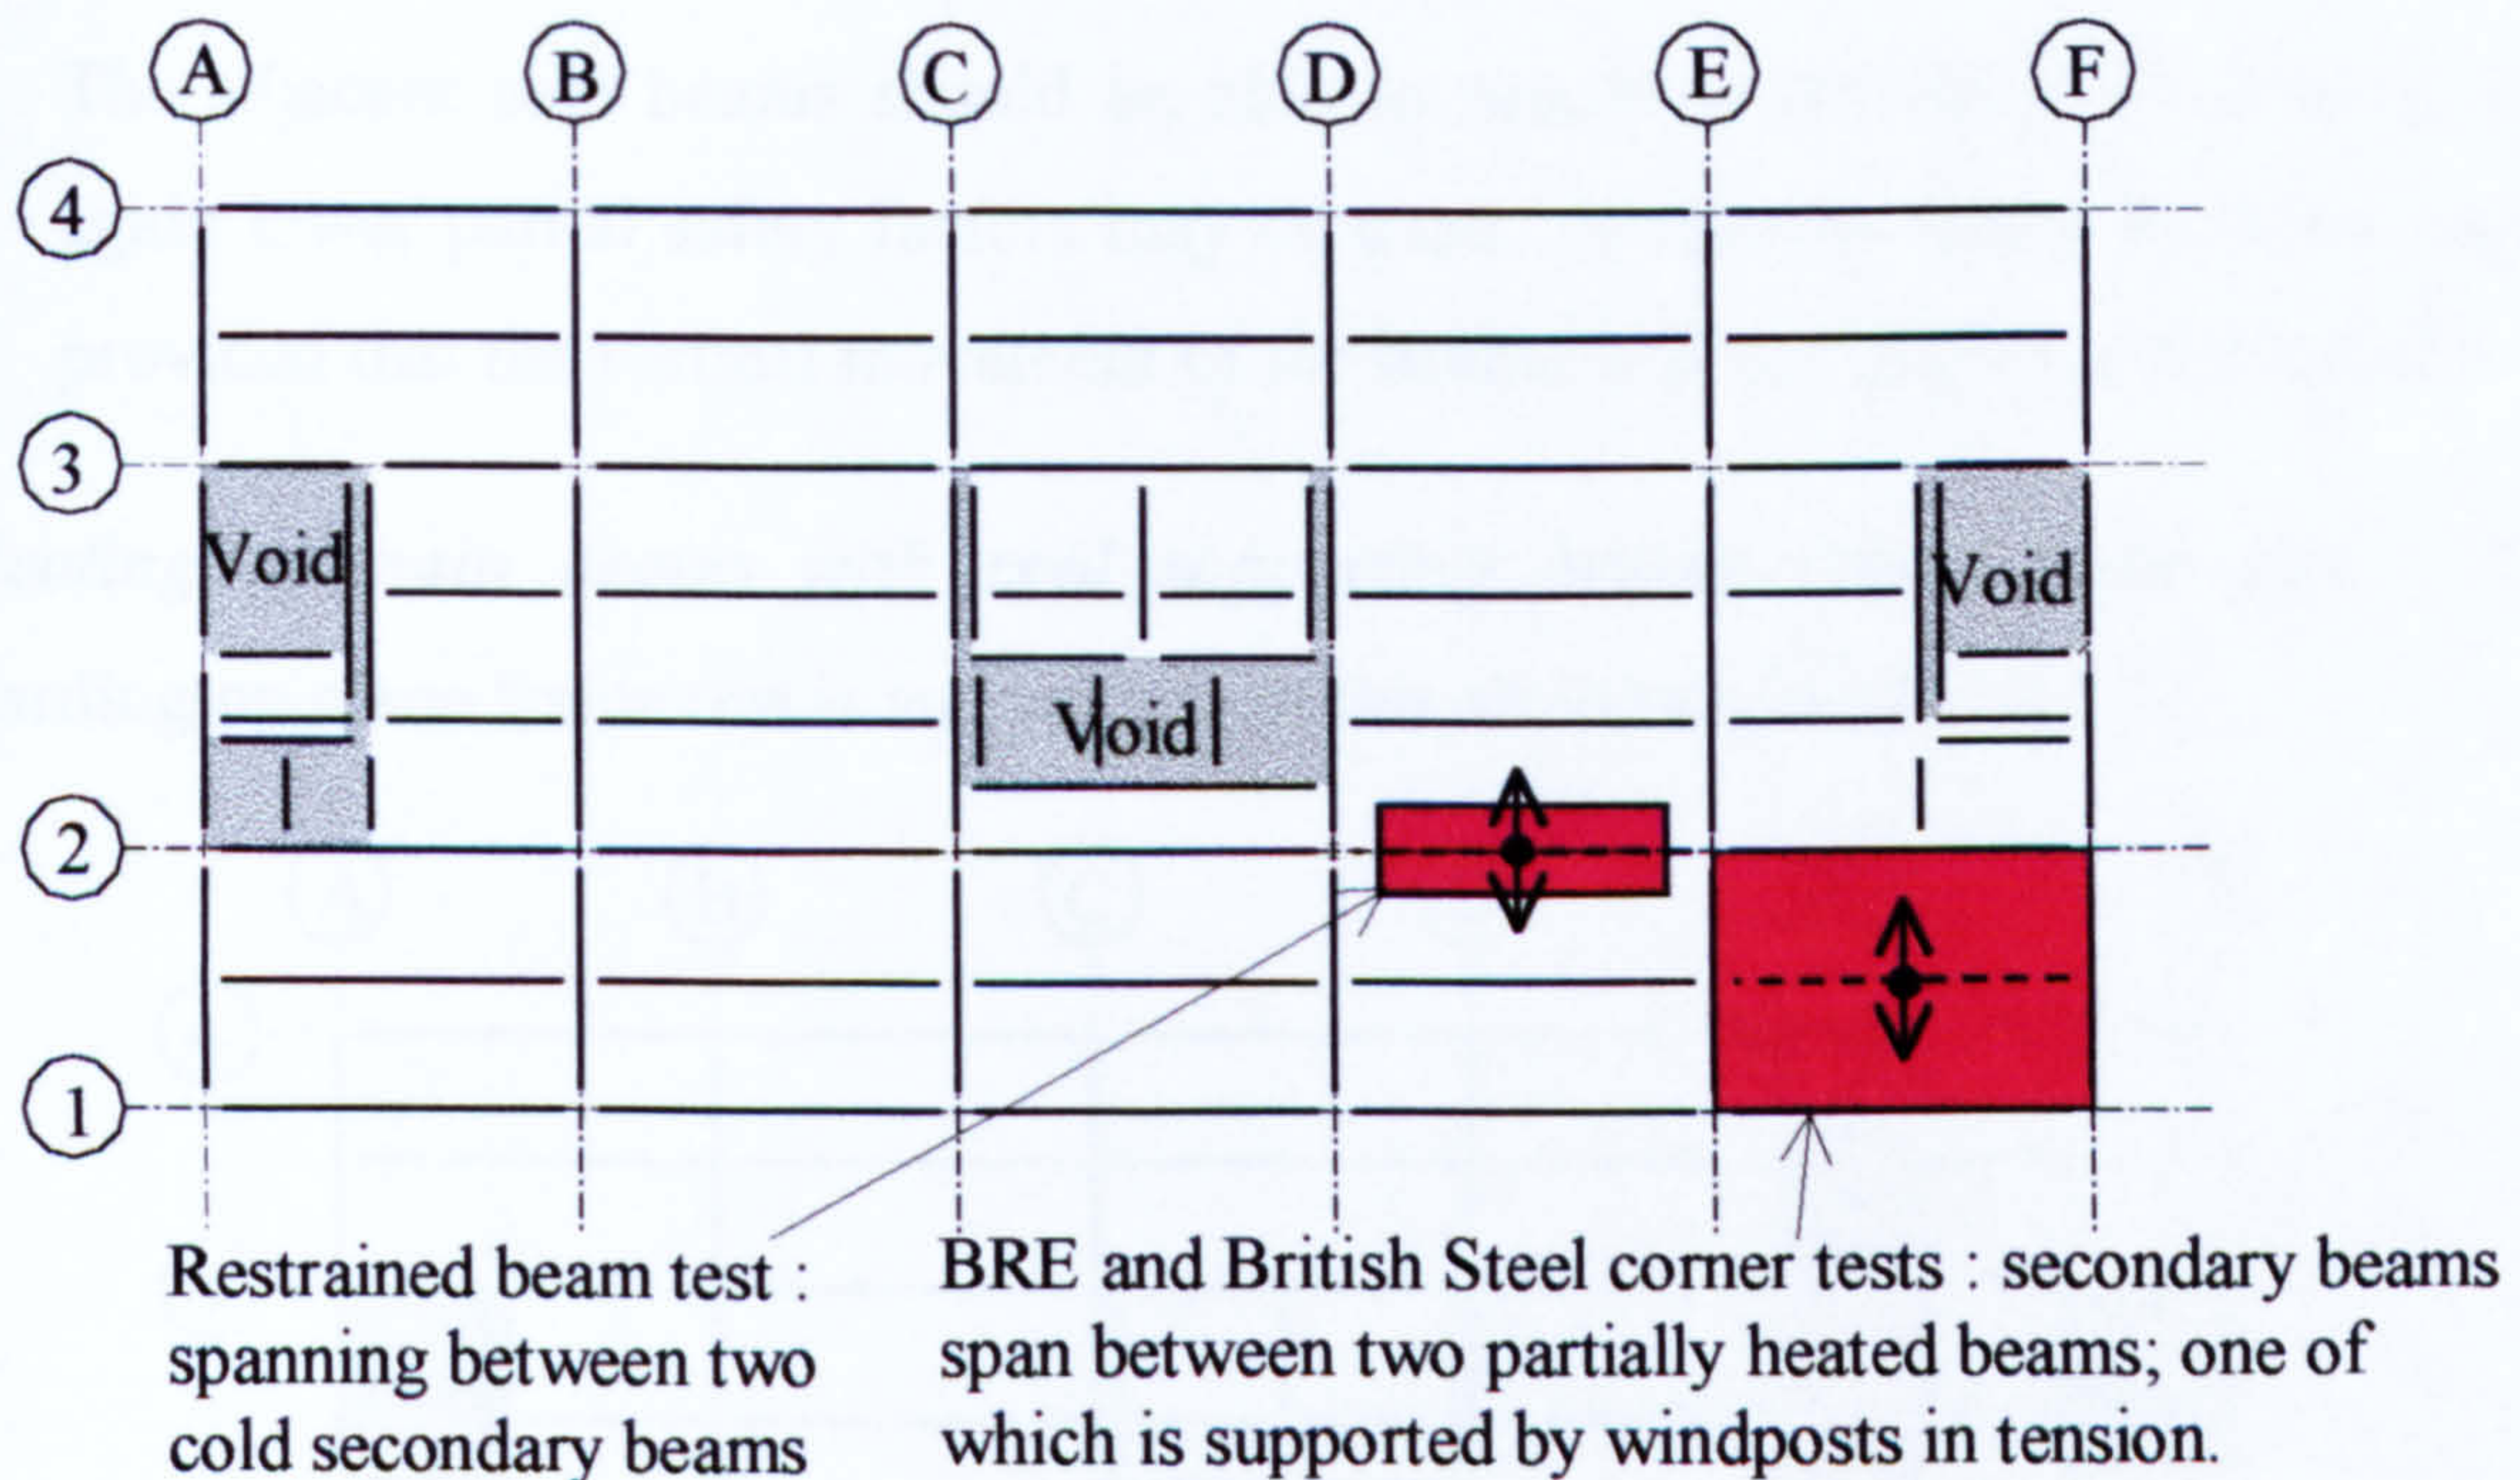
Schematic drawing of two examples of a floor slab spanning between adjacent beams
